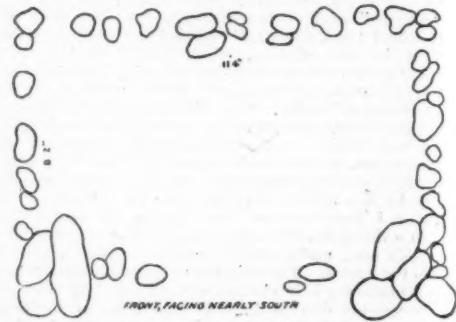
House-site above Sibley's, on opposite side of swamp, near Massachusetts Central Railway.
